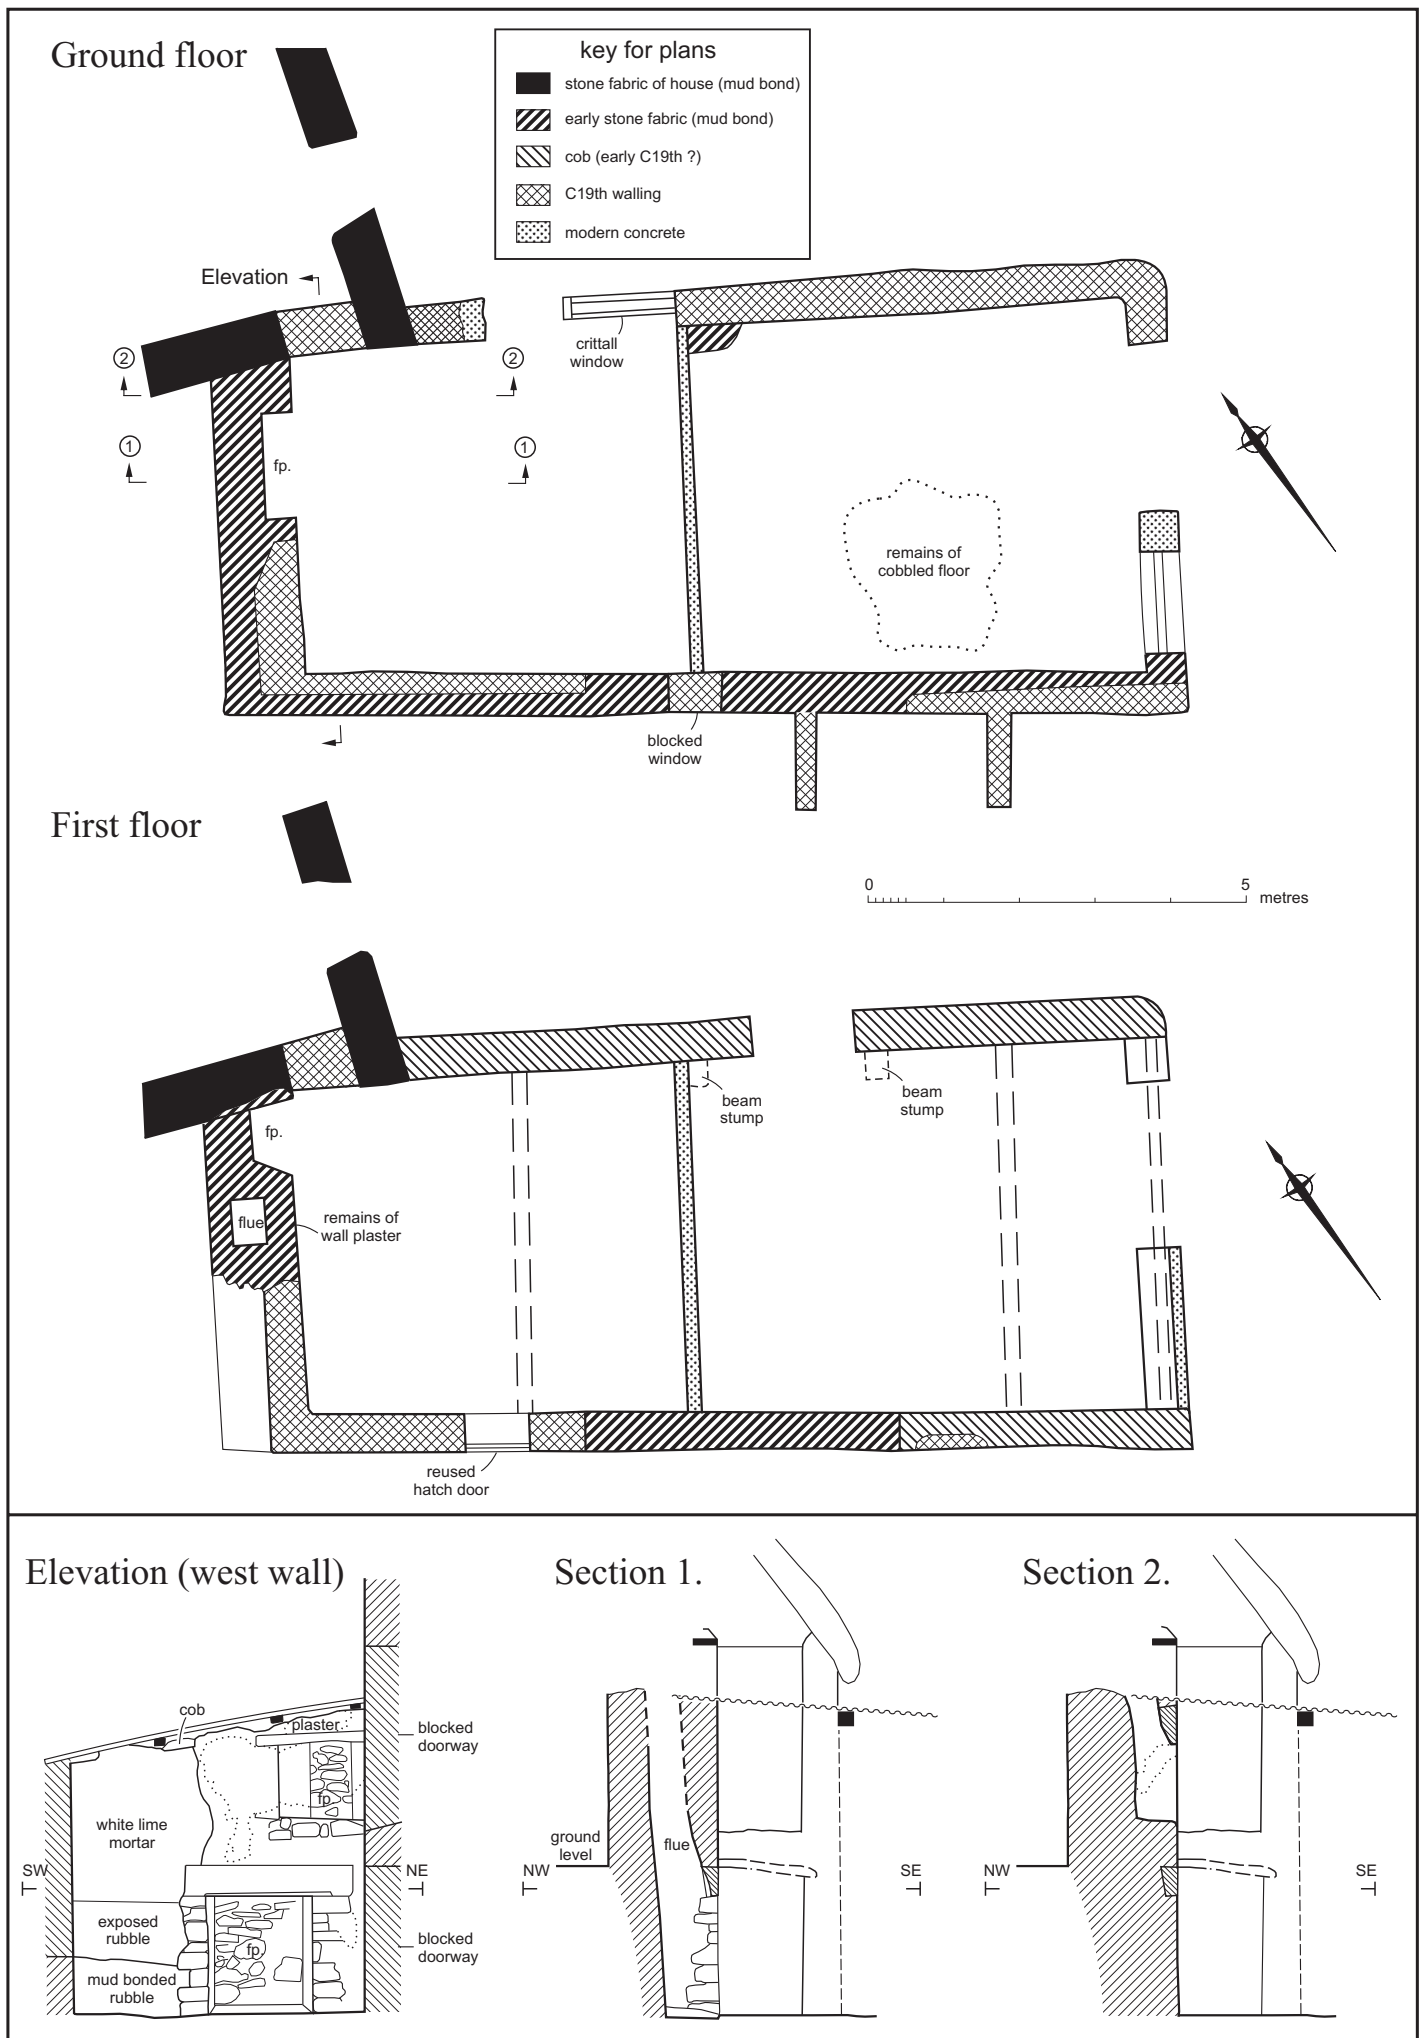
Phased plans of the building, at ground and first-floor level, showing the probable date of the fabric. Elevation and sections through the fireplaces.
